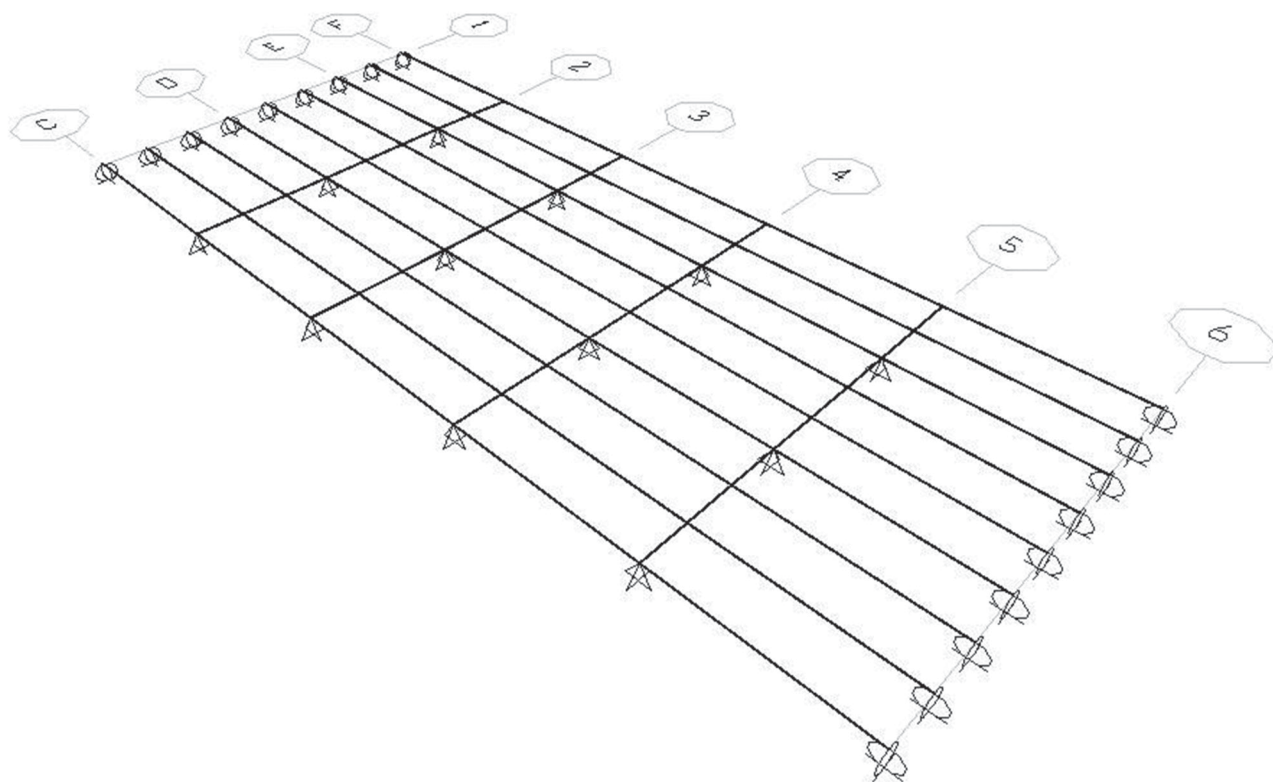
Finite element model of floor framing, Example 7.1.
